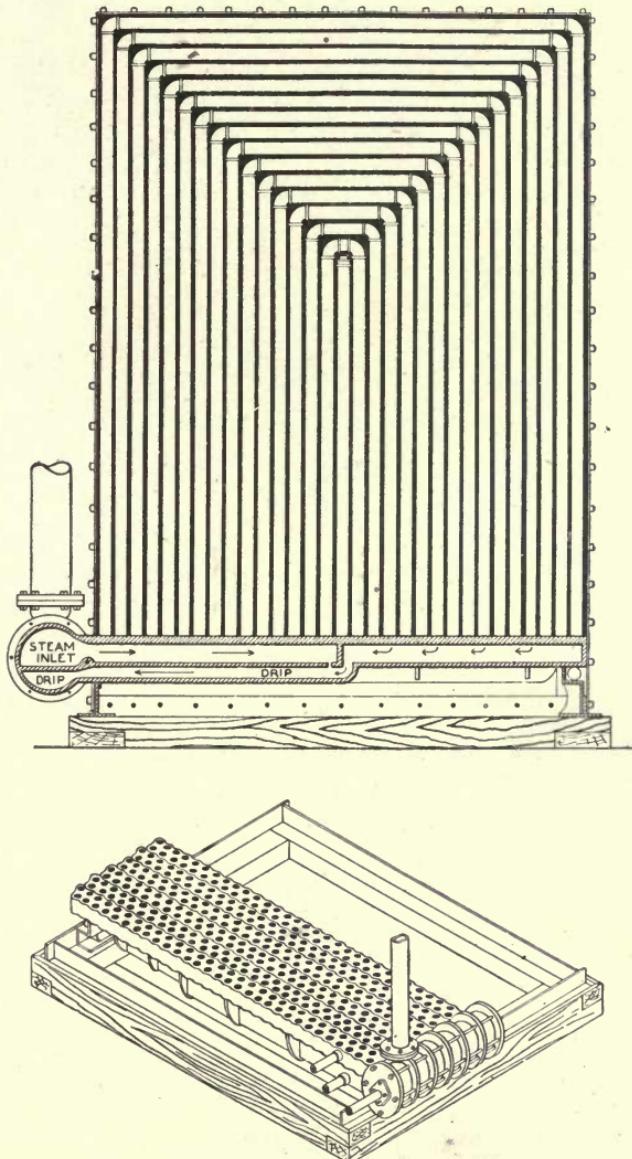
Showing Circulation of Steam in Large Coil-Pipe Radiator for Heating Mills, Shops, etc.
